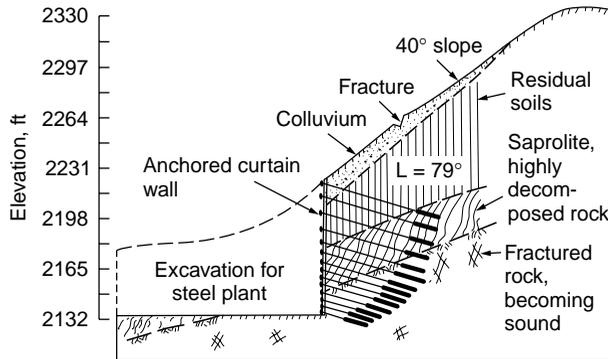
Section through a 25.5 m (85 ft) high anchored curtain wall constructed to retain a steep slope with a history of landslides. Joao Monlavade, M. G. Brazil. (Source: Hunt, R. E., and da Costa Nunes, A. J. 1978. Retaining walls: Taking it from the top. *Civ. Eng.*, ASCE, May, 73–75.)
